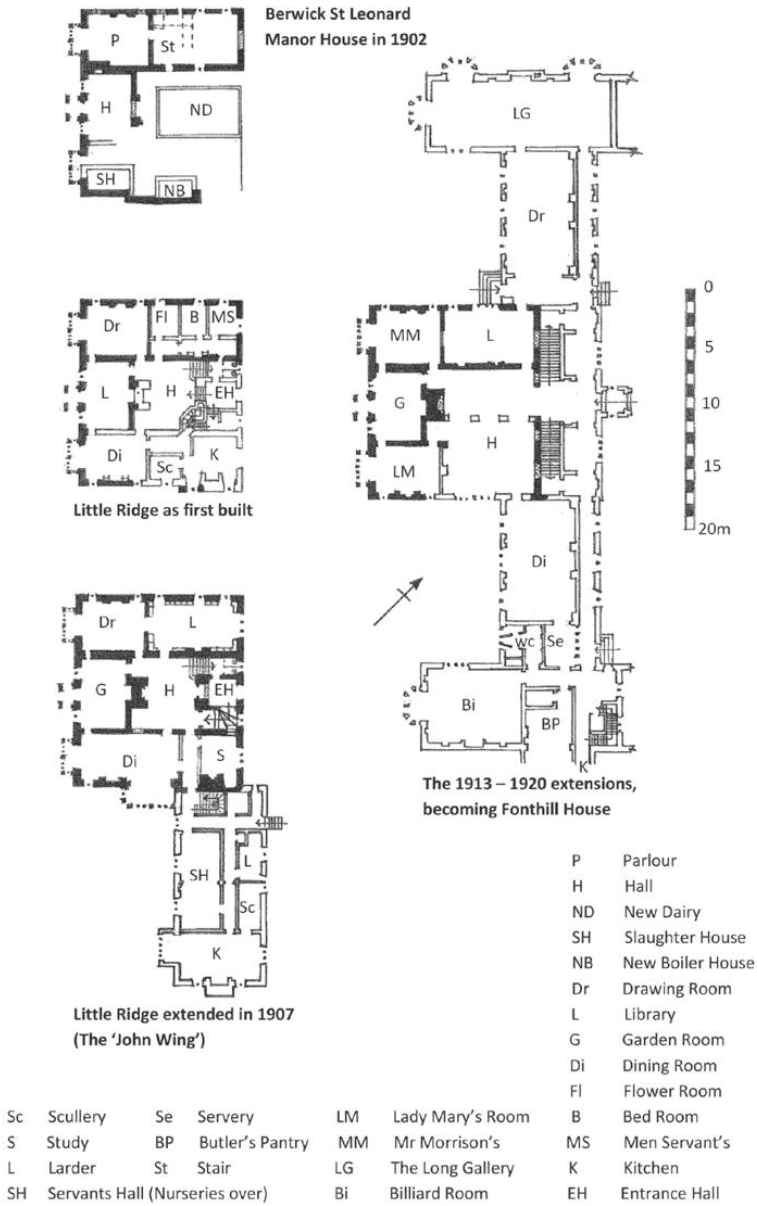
Ground floor plans, showing the ruined Berwick St Leonard Manor House prior to demolition, its re-erection as Little Ridge and subsequent extensions and enlargement.
